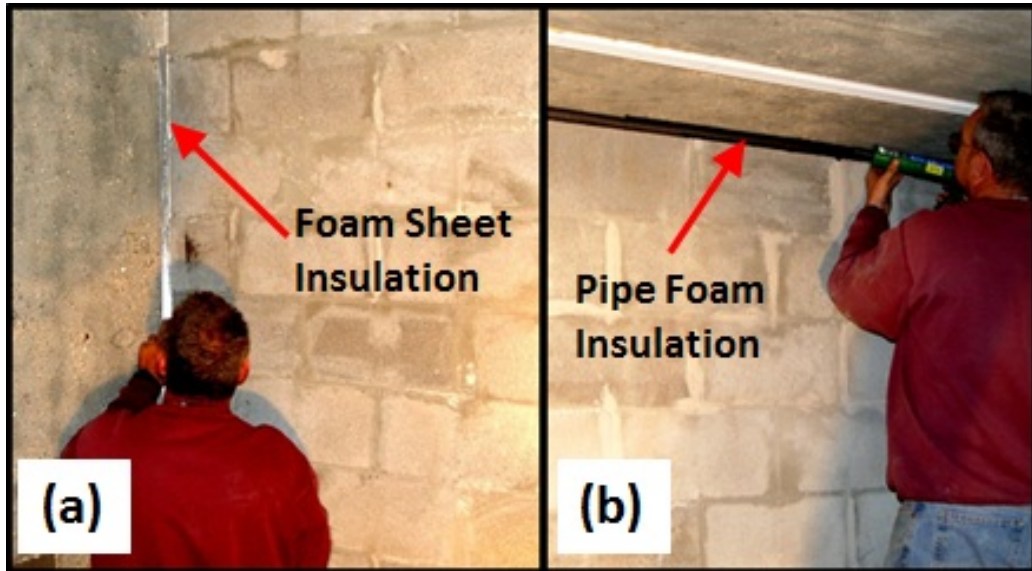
Materials used to fill gaps. (a) Wall insulation foam board placed in gap between reaction structure and wall. (b) Pipe foam insulation caulked in place to bridge gap between top support and wall.
